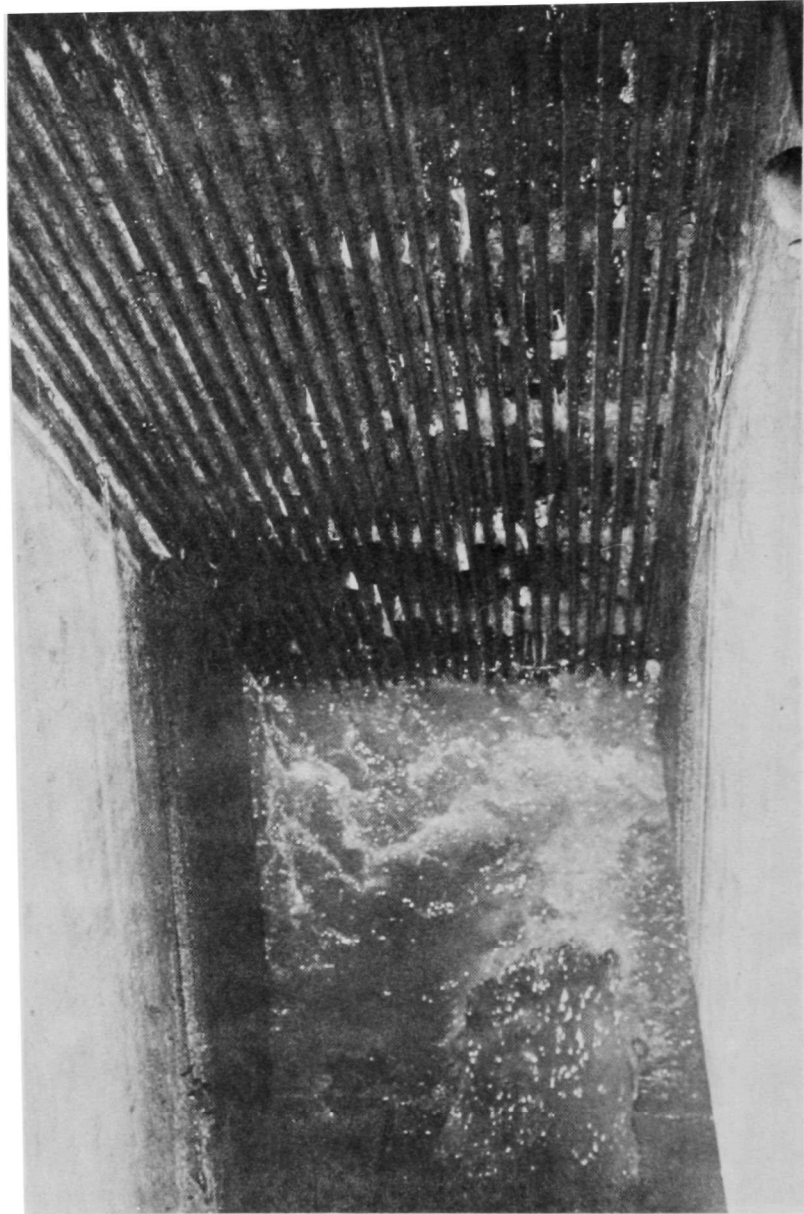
24 inch trunk sewer discharging to Bay Street pumping station. Pumps are protected by a hand-raked bar screen.
